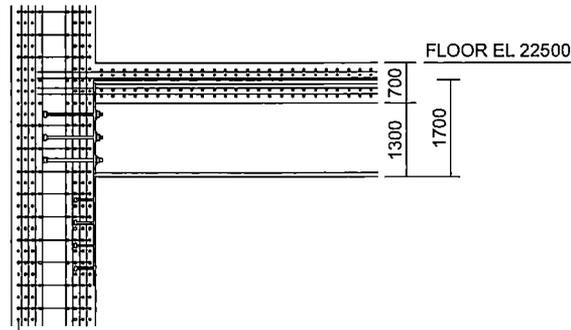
FB Reinforced Concrete Girder Reinforcing Schedule
